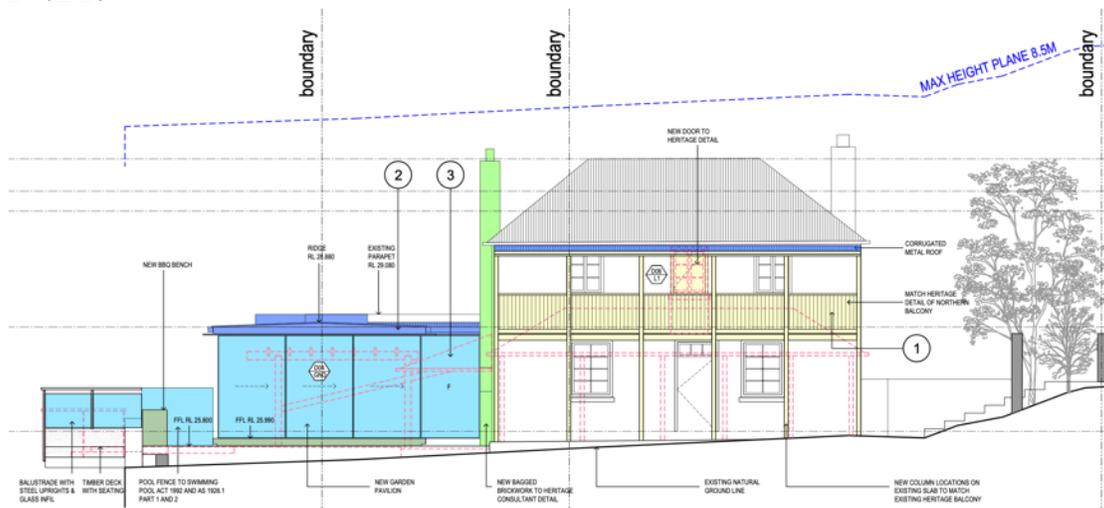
, Proposed southern elevation with pavilion addition and alterations to pool area, Michael Cumming Architect, 24.02.23
